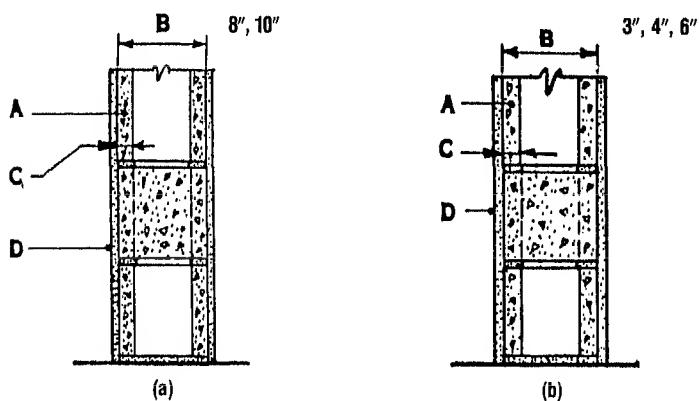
Hollow concrete masonry units (sections). (a) Bearing, (b) Non-bearing. A=concrete masonry units conforming to ASTM, *Standard Specifications for Hollow Load-Bearing Concrete Masonry Units*; B=nominal wall thickness, C=nominal shell thickness, D=gypsum plaster.
